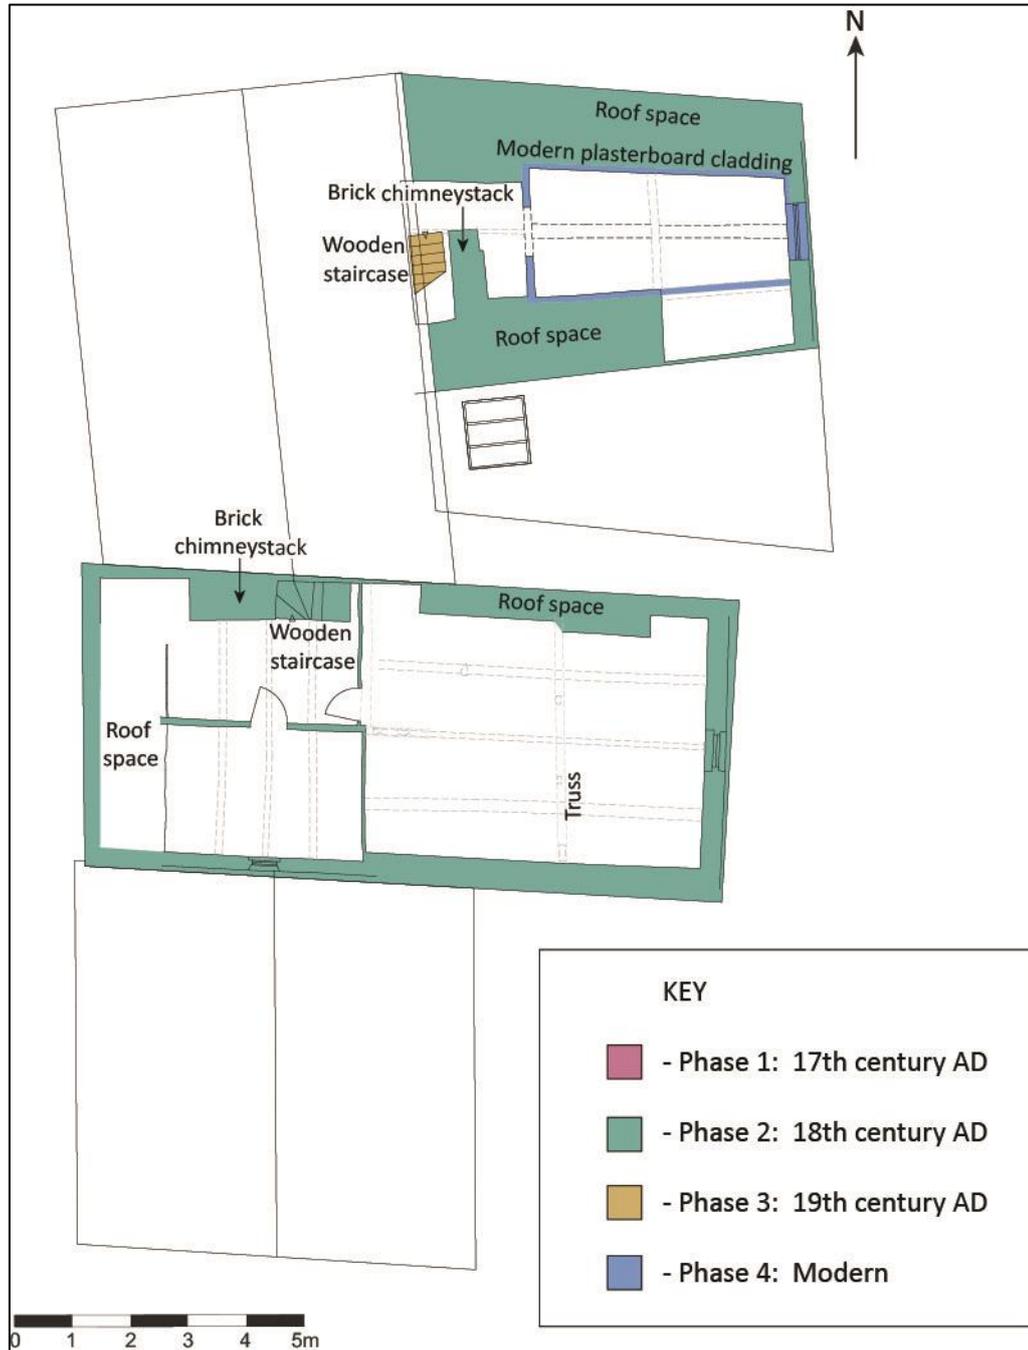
Phased plan of attic space at Nos. 17 & 17A High Street
